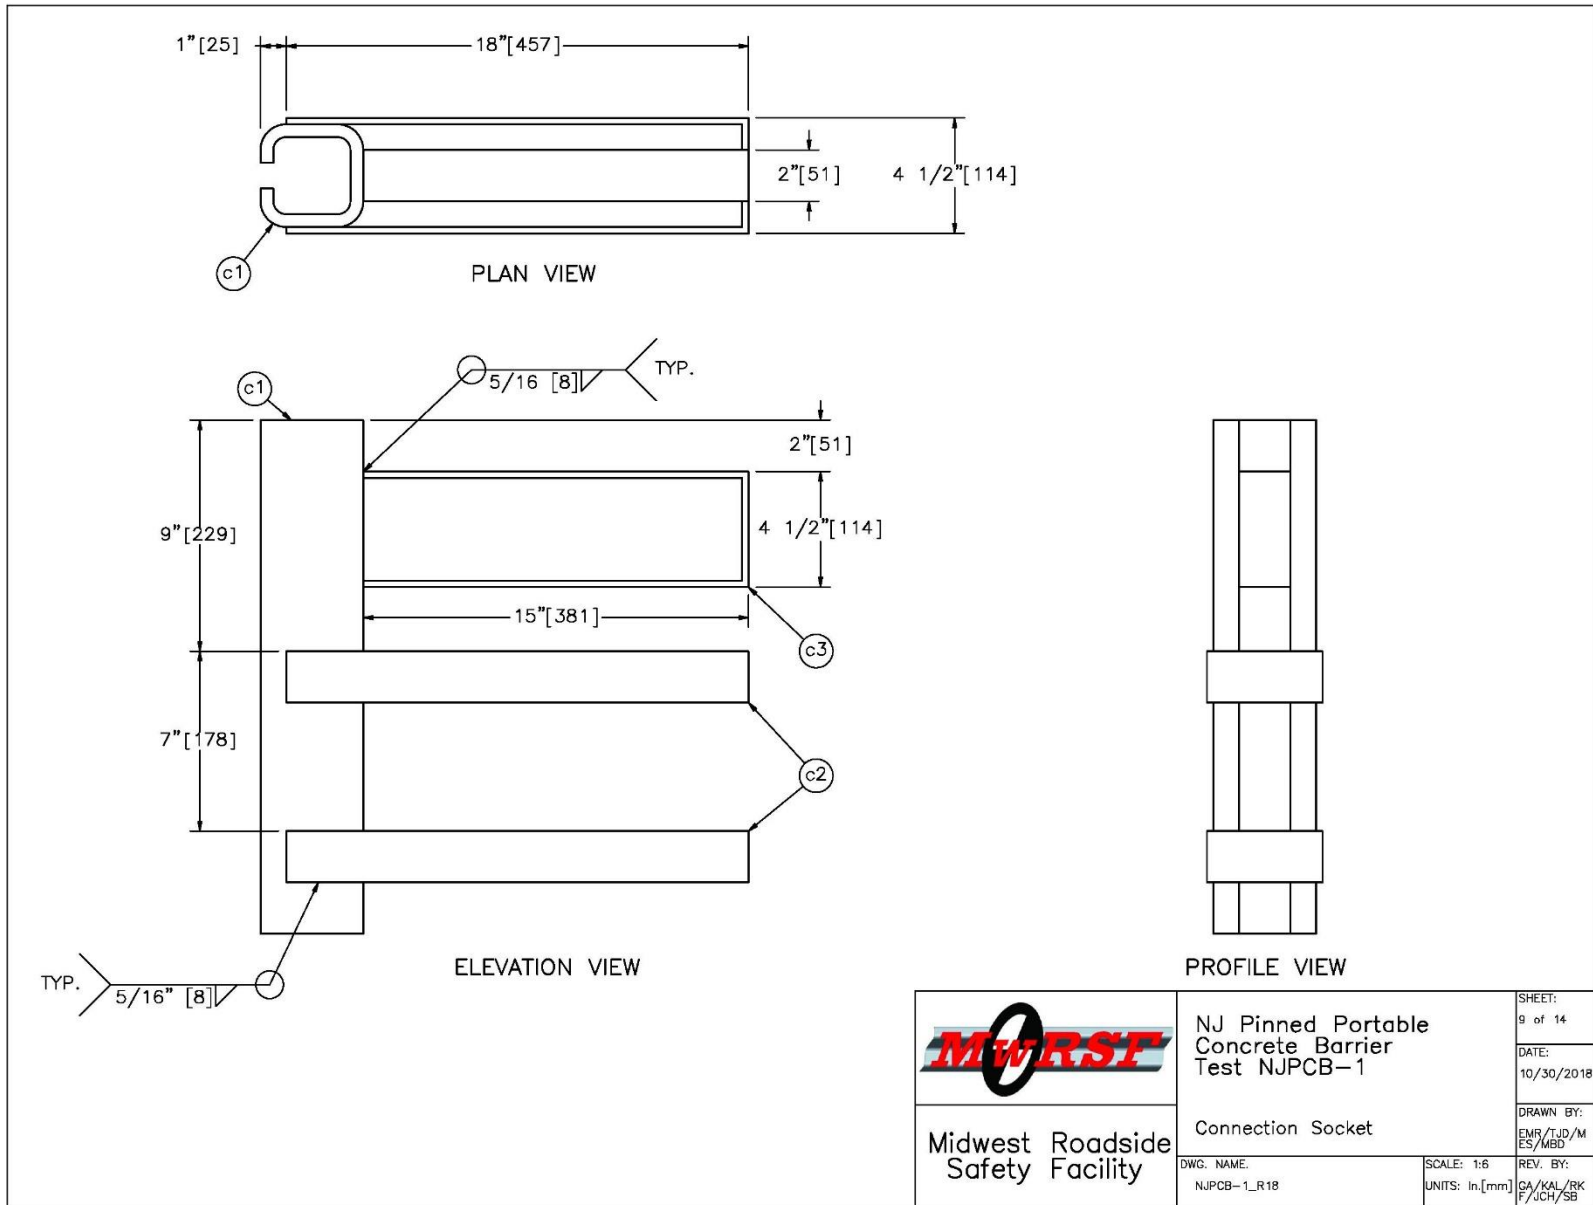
PCB Connection Socket Details, Test No. NJPCB-1
